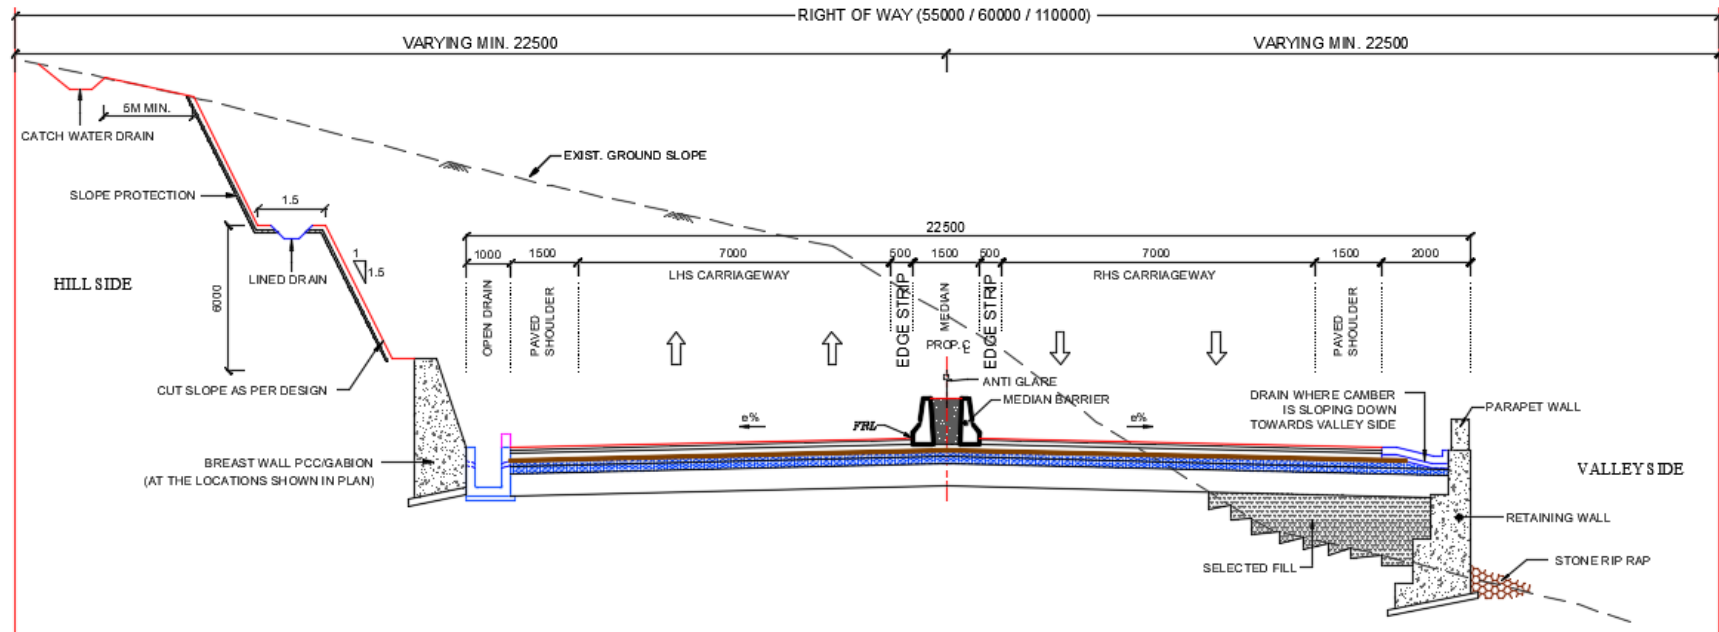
4-Lane divided highway with Breast Wall on Hill Side and Realignment wall on Valley Side (TCS-7)
